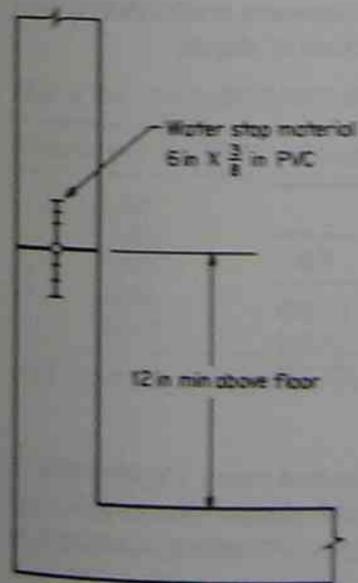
Water stop detail, water stop to be lap-spliced 4 in on each side of vertical joints and continuous around all corners. (Courtesy Consolidated Edison Co.)
